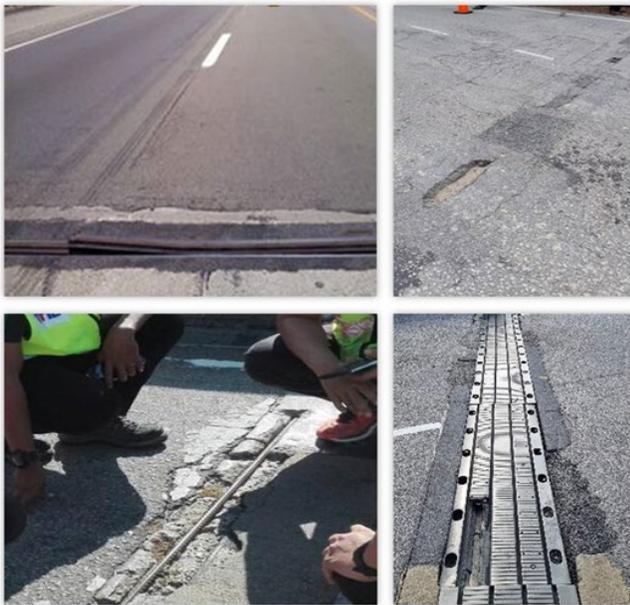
Conventional bridge joints deterioration, from Public Works Department (JKR) Malaysia
